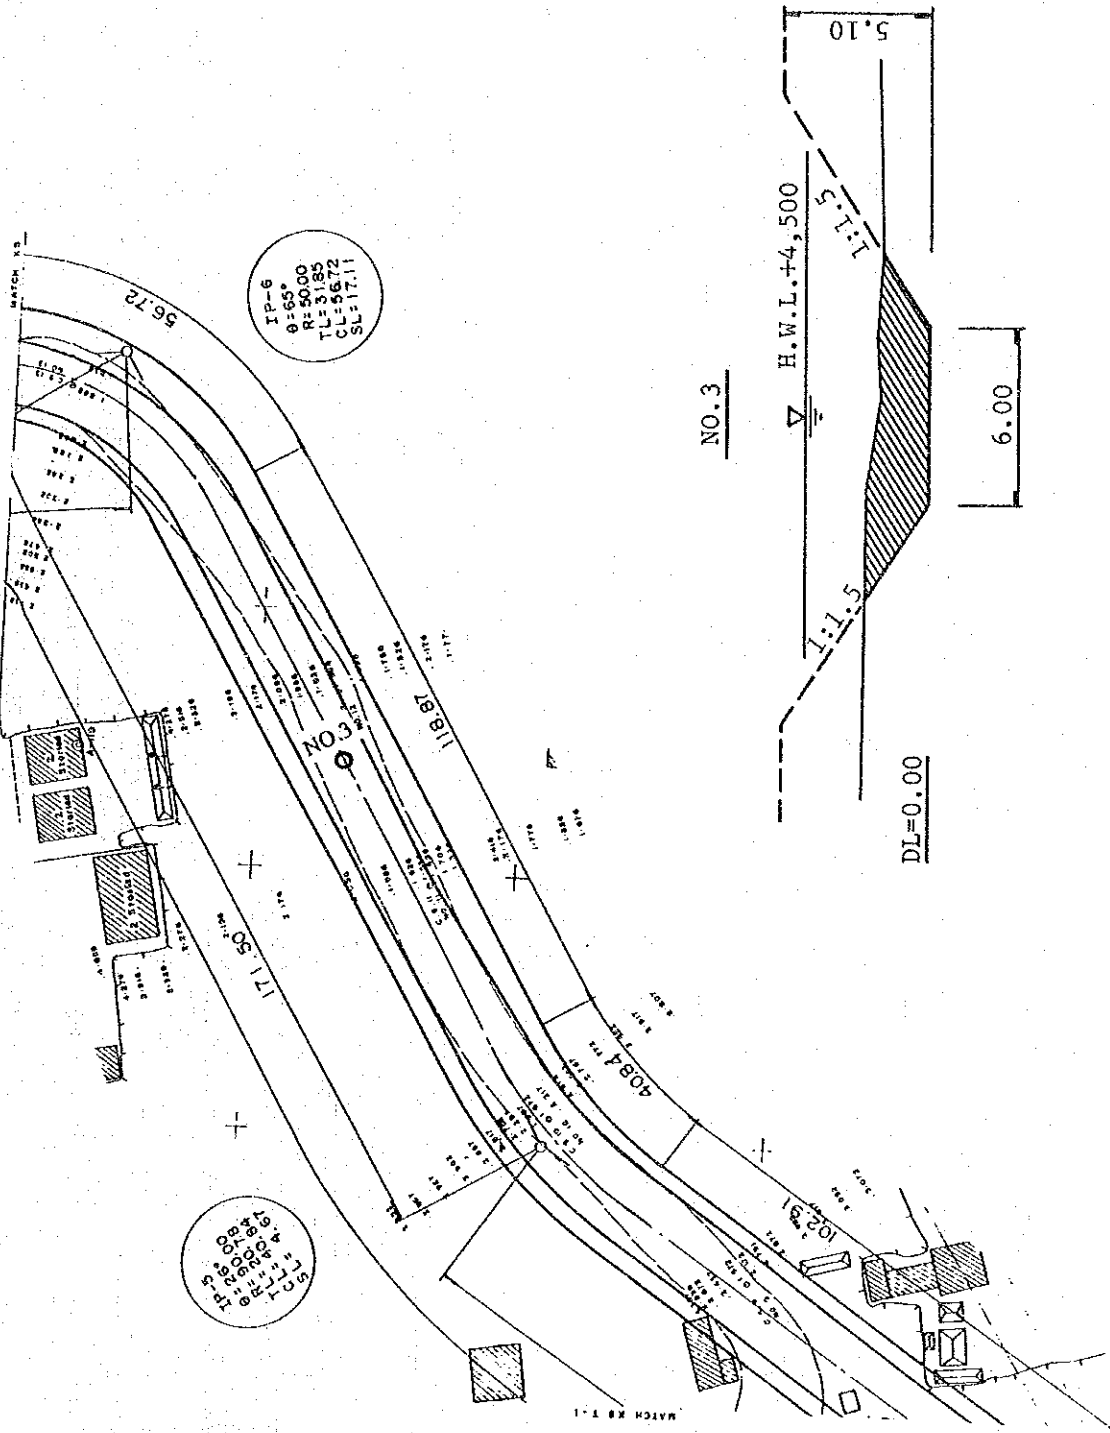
TYPICAL DESIGN OF KHAL IMPROVEMENT (3)
